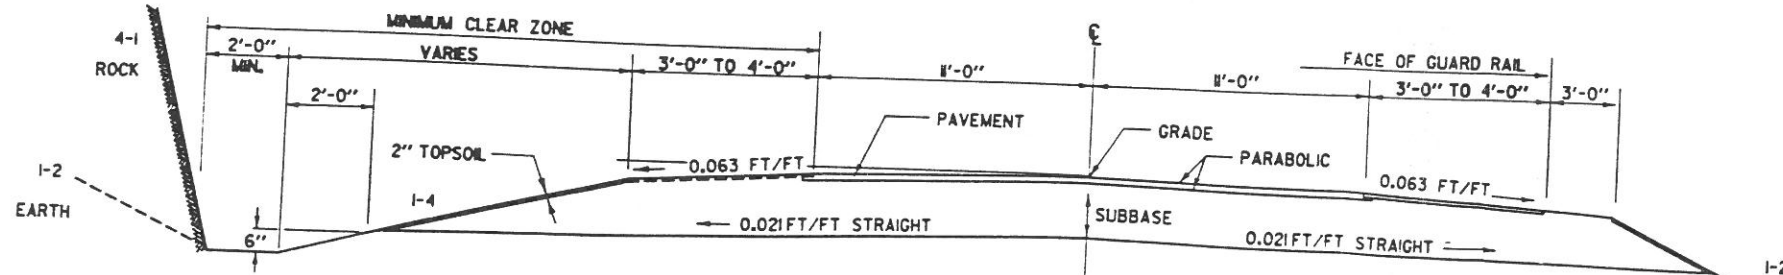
DETAIL OF GUARD RAIL ON HIGH SIDE OF BANKED SECTION
